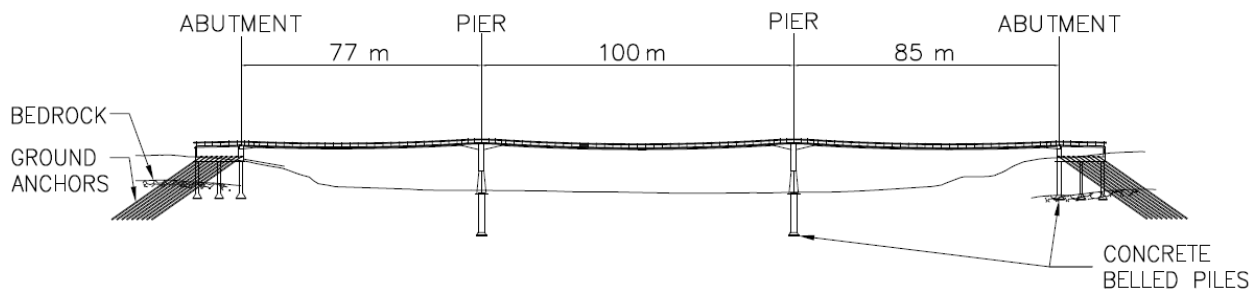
General layout of Terwillegar Park Footbridge in elevation
